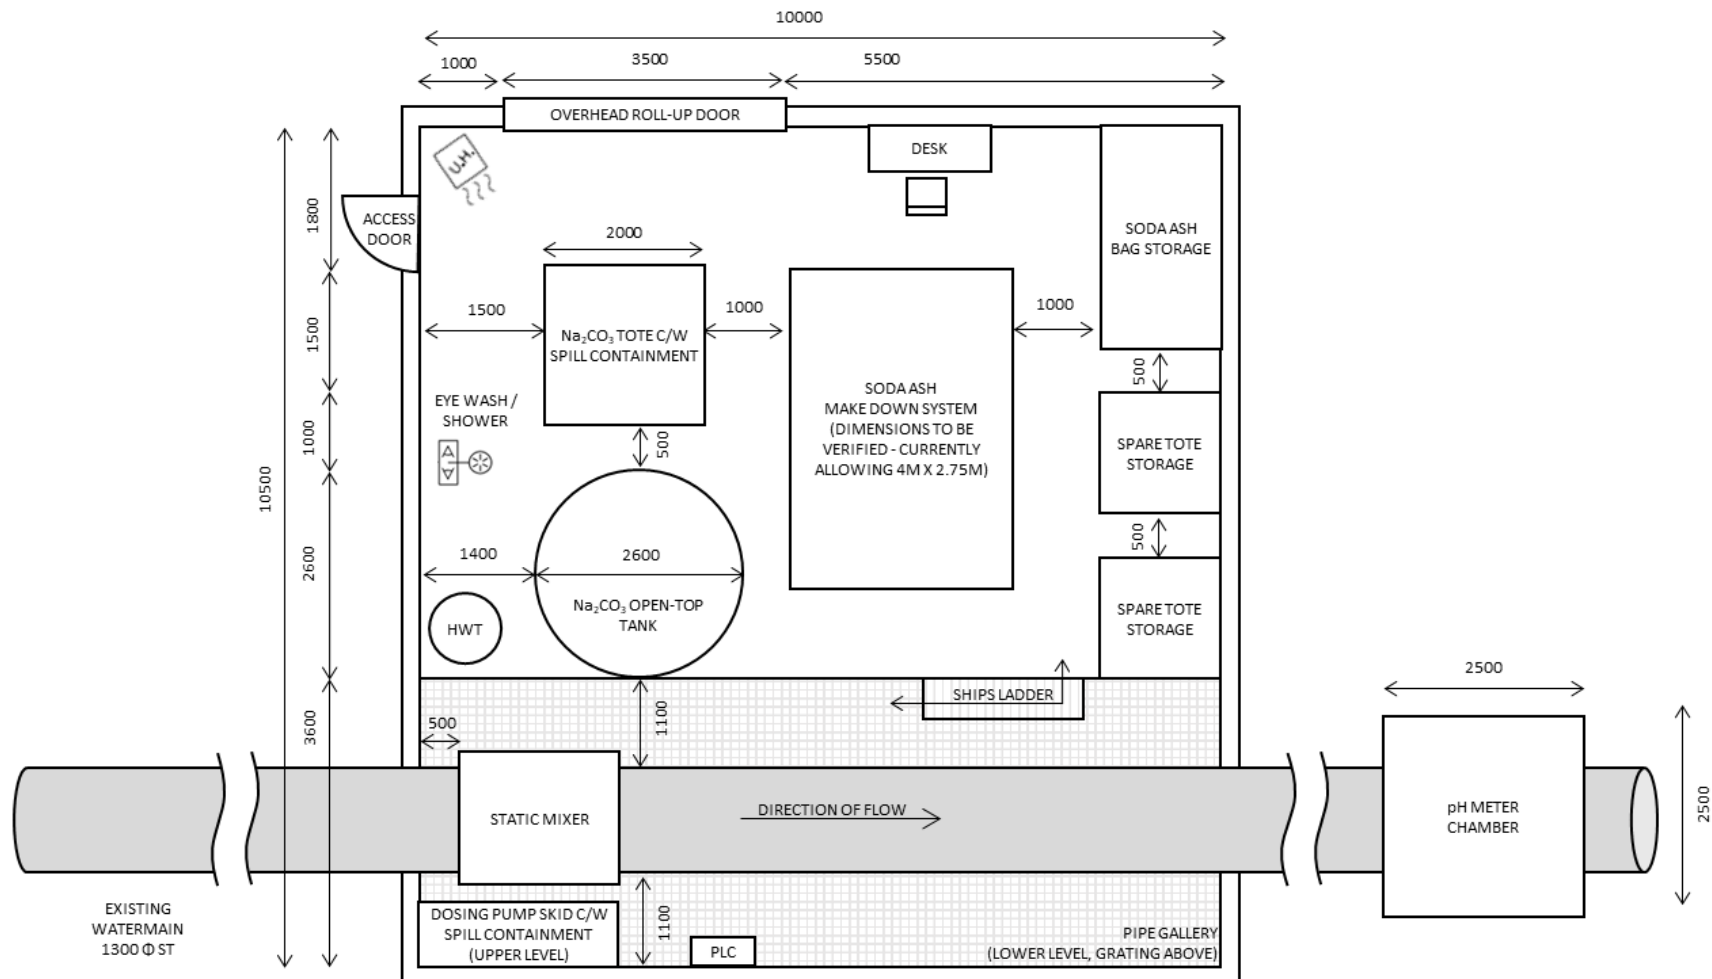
Proposed Main #4 Facility Layout (Concept Level)
